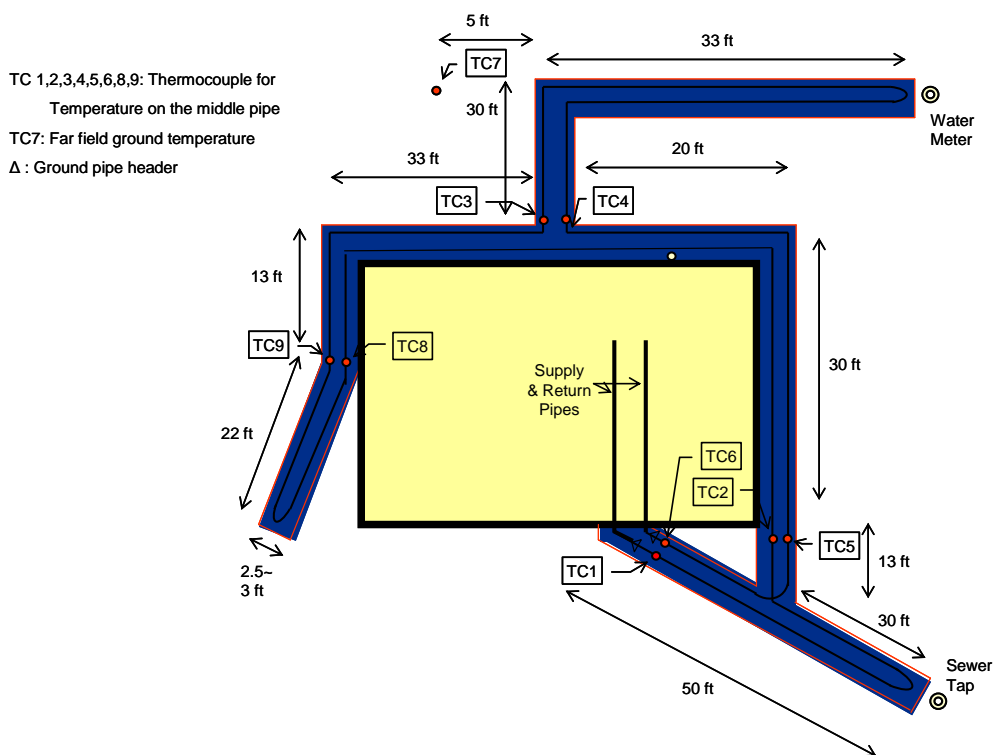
Locations and lengths along trenches where ground heat exchanger pipe was installed for ZEH5.
